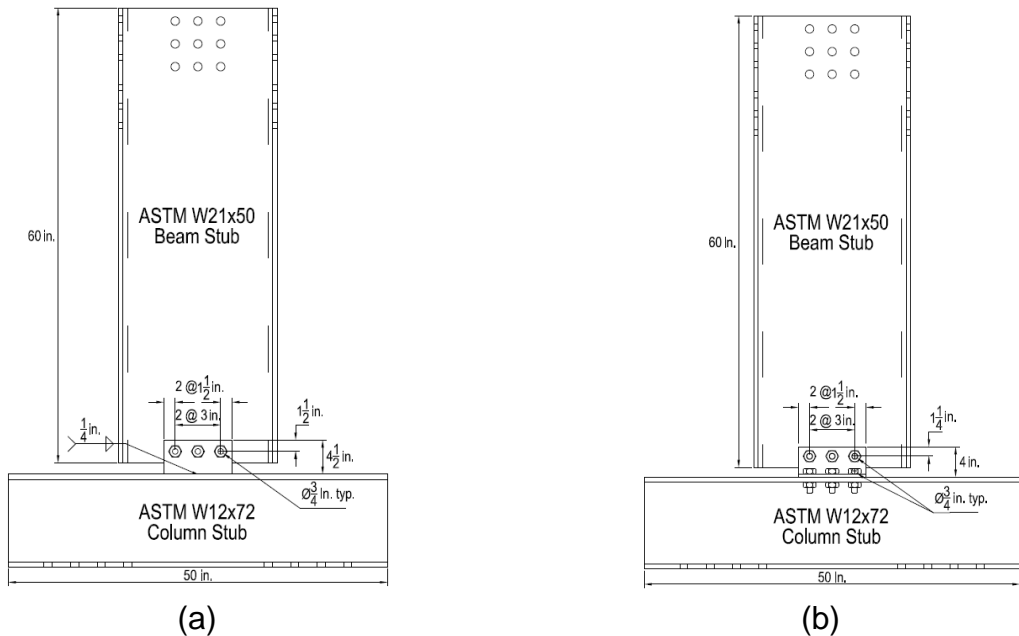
(a) Typical single-plate shear specimen, and (b) typical bolted angle specimen (1 in = 25.4 mm). For both: dimensions vary, see Tables 1 and 2.
